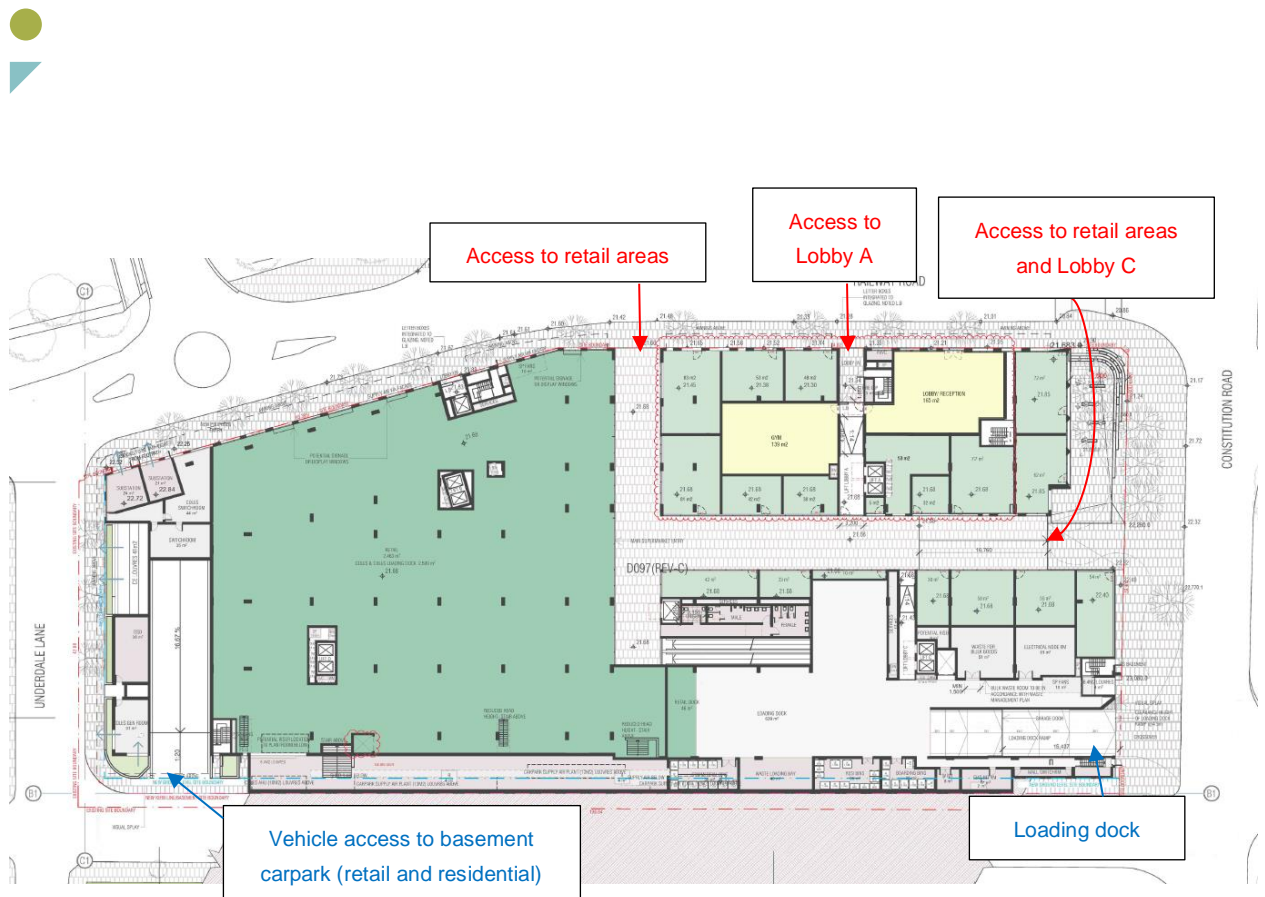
Ground floor plan with pedestrian and vehicle access indicated.
